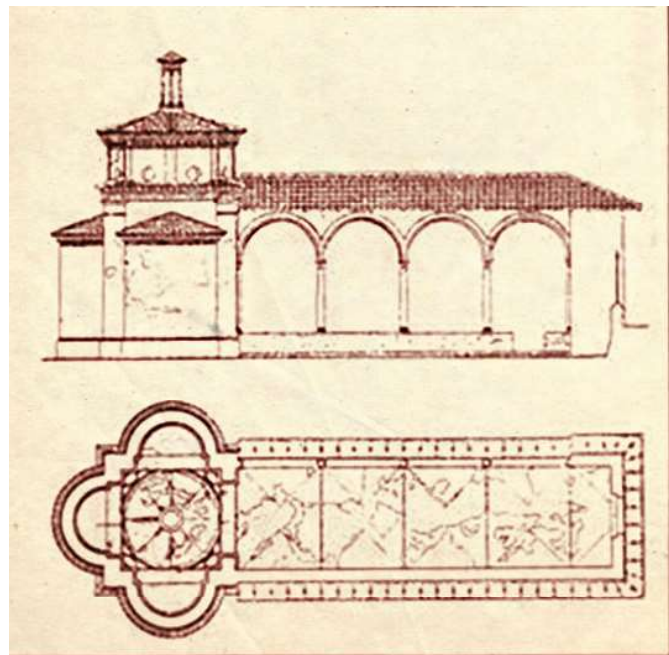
Plan and elevation of Cascina Pozzobonelli
